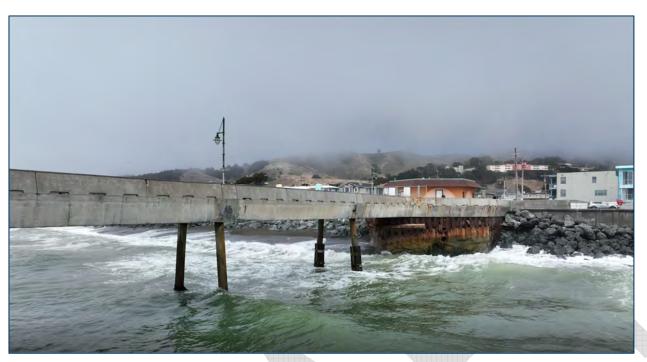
Deck Exterior between Bent 1C and Pier Abutment – South Face
